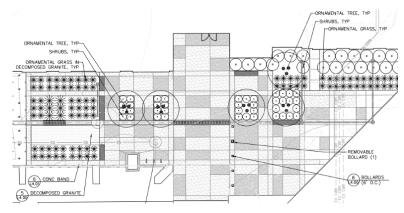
| Bird's Eye View of Concrete Pattern and Vegetation Arrangement
